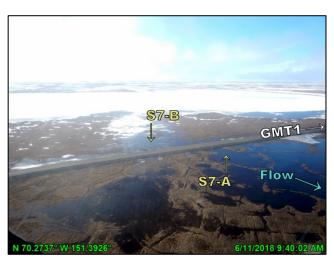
Drainage equalized on both sides of the GMT1 access road near S7 monitoring location, looking southwest; June 11, 2018
